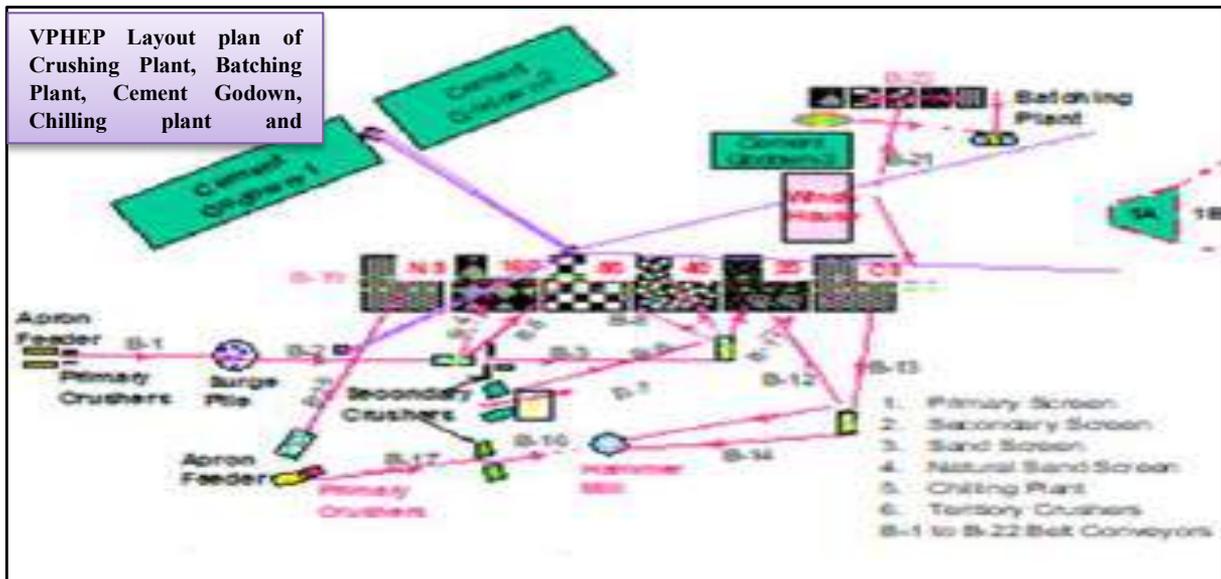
Sketch showing crushing plant, batching plant, cement go down and Tower Crane details
